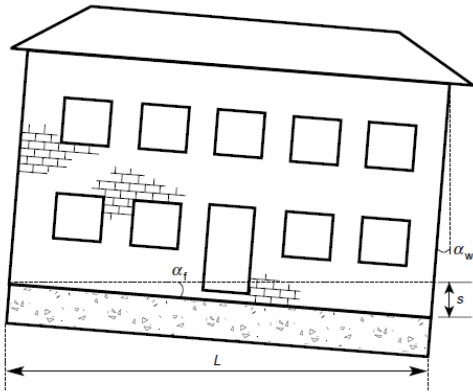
House on stiff raft foundation undergoing tilt, see box below
